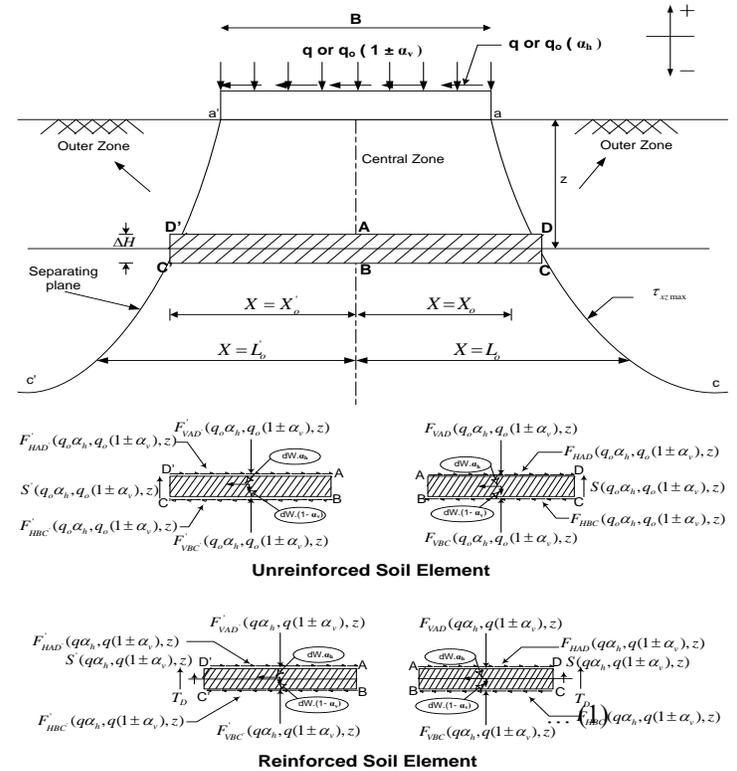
Assumed separating planes and components of forces for pressure ratio calculation of isolated strip foundation on reinforced soil. (unsymmetrical) ... (2b)
